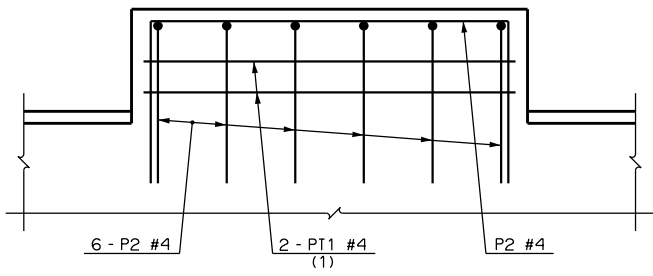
DETAILS OF PIER NOS. 1 AND 3 (SHEET NO. 1 OF 3)
